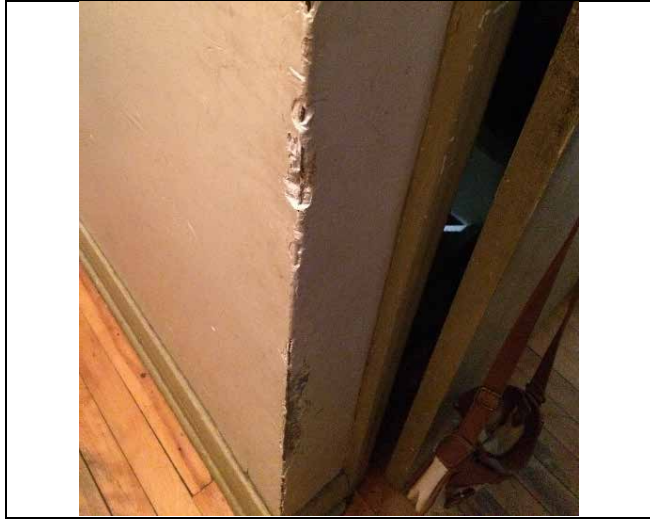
Asbestos-containing drywall joint-fill compound in the corridor of 43 Brighton Crescent.
